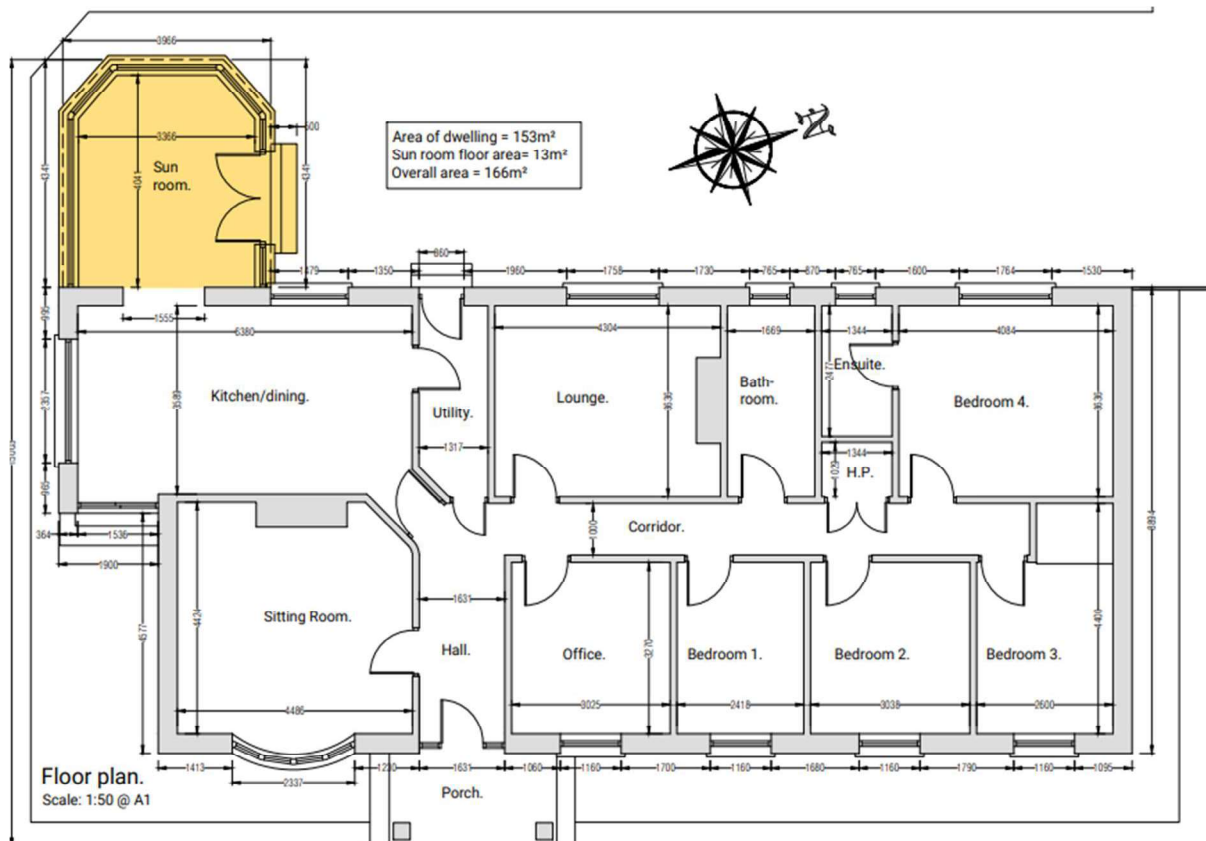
Floor Plan of existing dwelling (existing sunroom highlighted in yellow)
